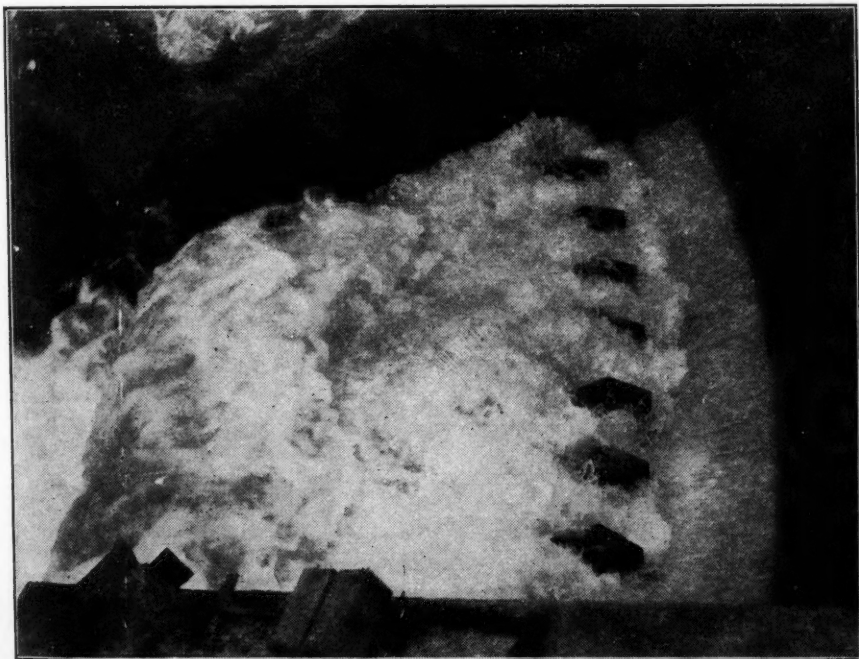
PIT NO. 3 TEST DAM: EXPERIMENT NO. 6. SAME AS FIG. 7, BUT WITH GAUGE HEIGHT PROPORTIONAL TO 10 FEET ON ACTUAL DAM.
